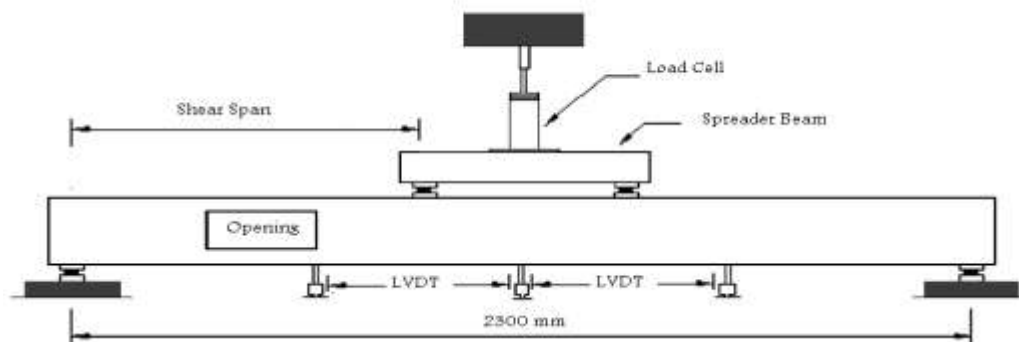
BEAM WITH WEB OPENING INSTRUMENTATIONS
